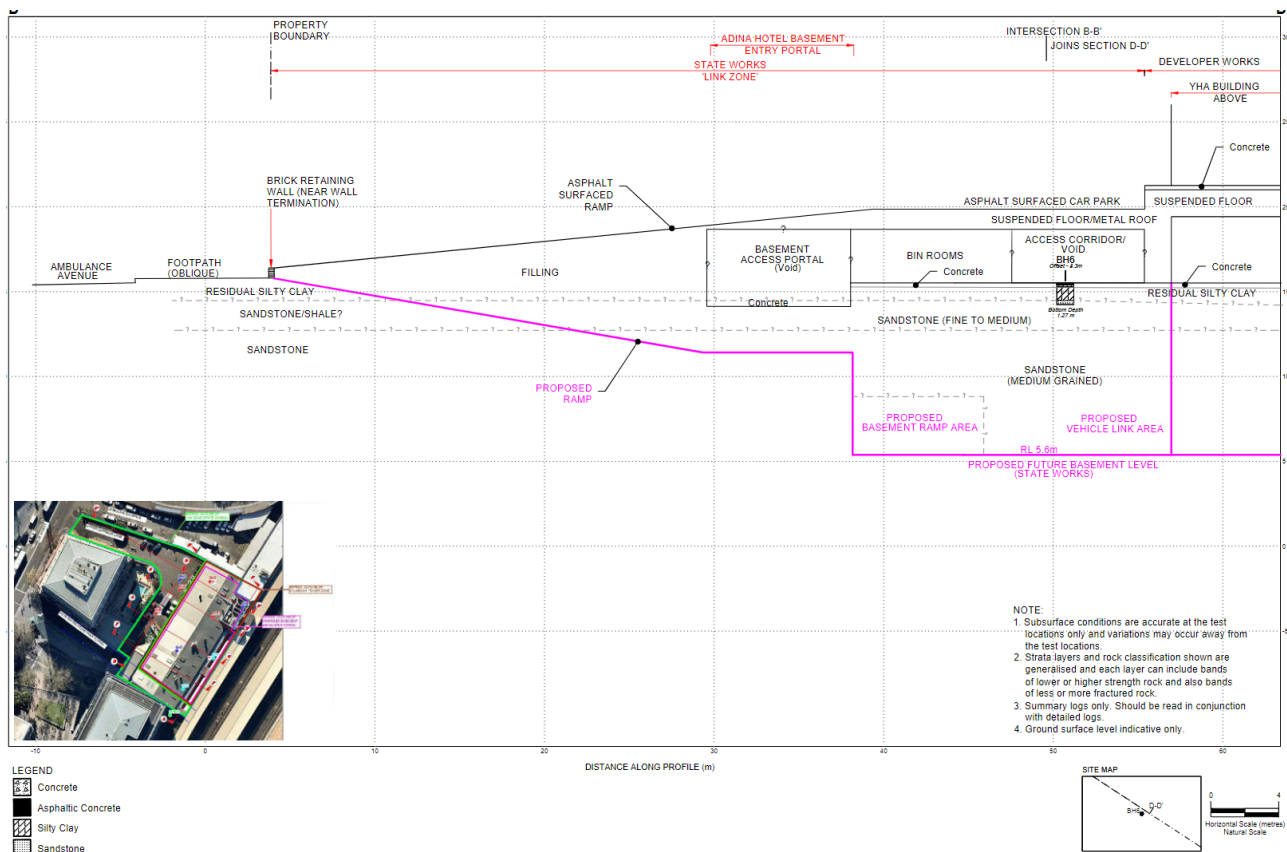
Interpreted Geotechnical Cross-Section D"-D', Proposed Commercial Development 8-10 Lee Street, Haymarket
